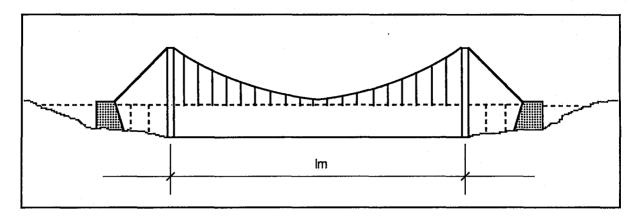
SINGLE SPAN SUSPENSION BRIDGE WITH INDEPENDENT APPROACH SPANS OUTSIDE THE PYLON
